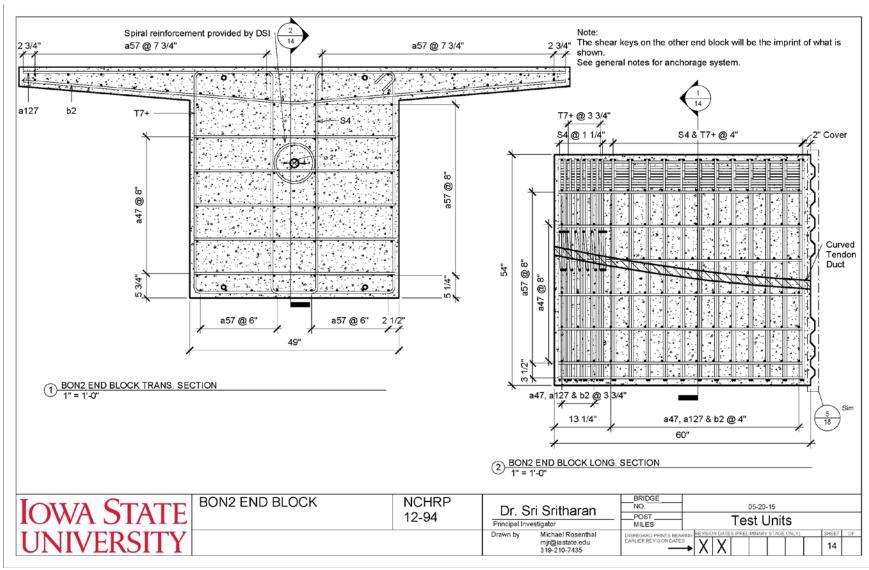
BON2 End Block Longitudinal and Transverse Section
